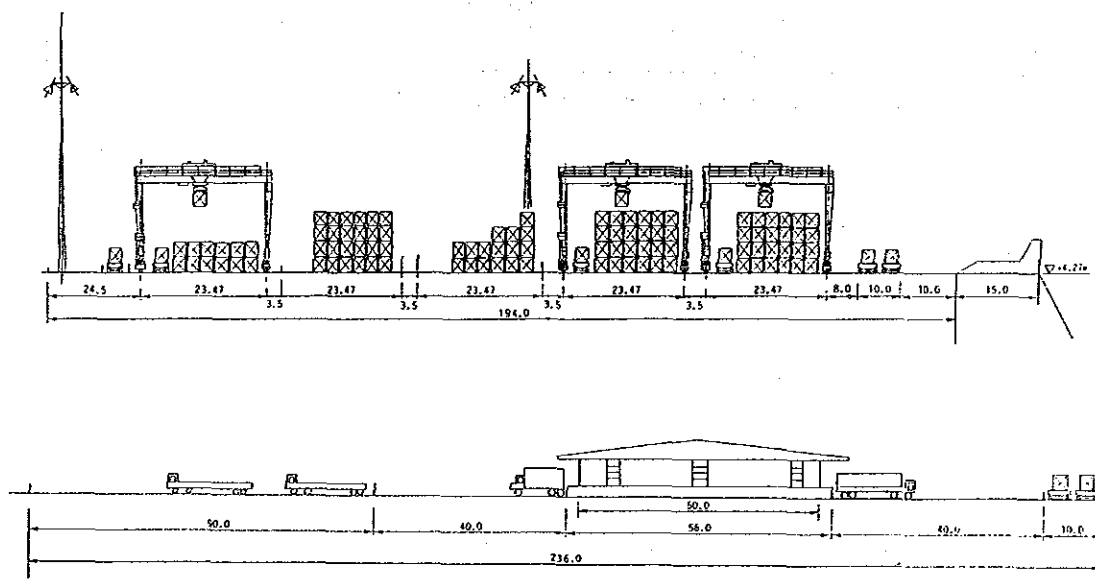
A Cross Section of Shutaify Bay Yard (Unit: m)
